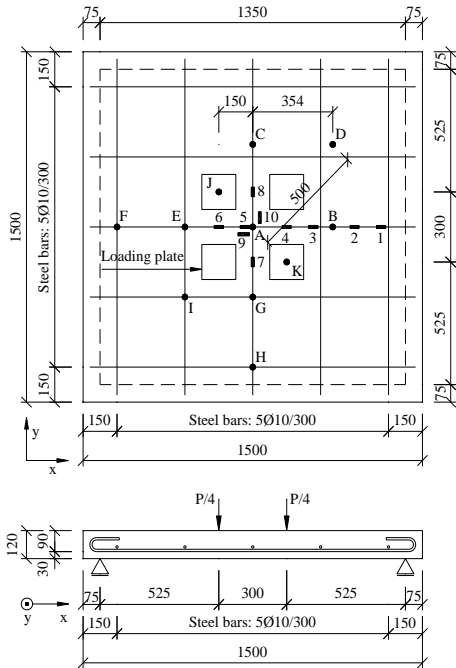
Test specimen layout and steel reinforcement details (all dimensions in mm).
